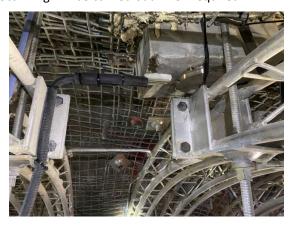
Example of radial pressure cell installed above the arch of the Lattice Girders
